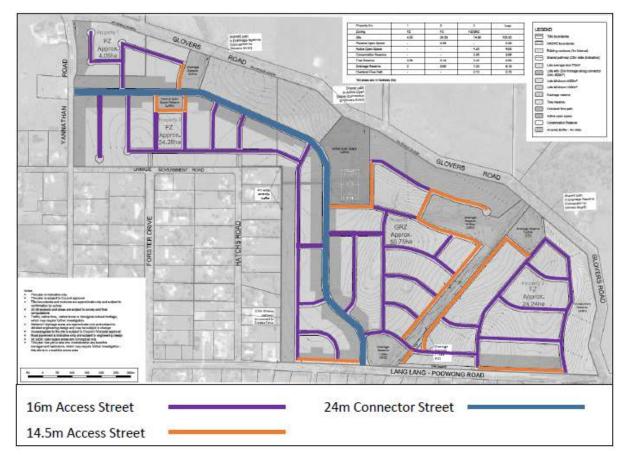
Internal Road Hierarchy Plan Source: Beveridge Williams Traffic and Transport Assessment, October 2018
